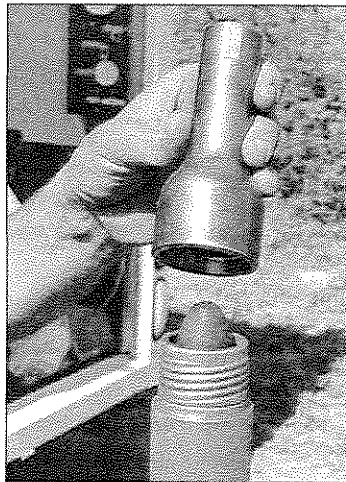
Place a drive bumper on top of the inner rods and thread a drive cap onto the outer casing.
